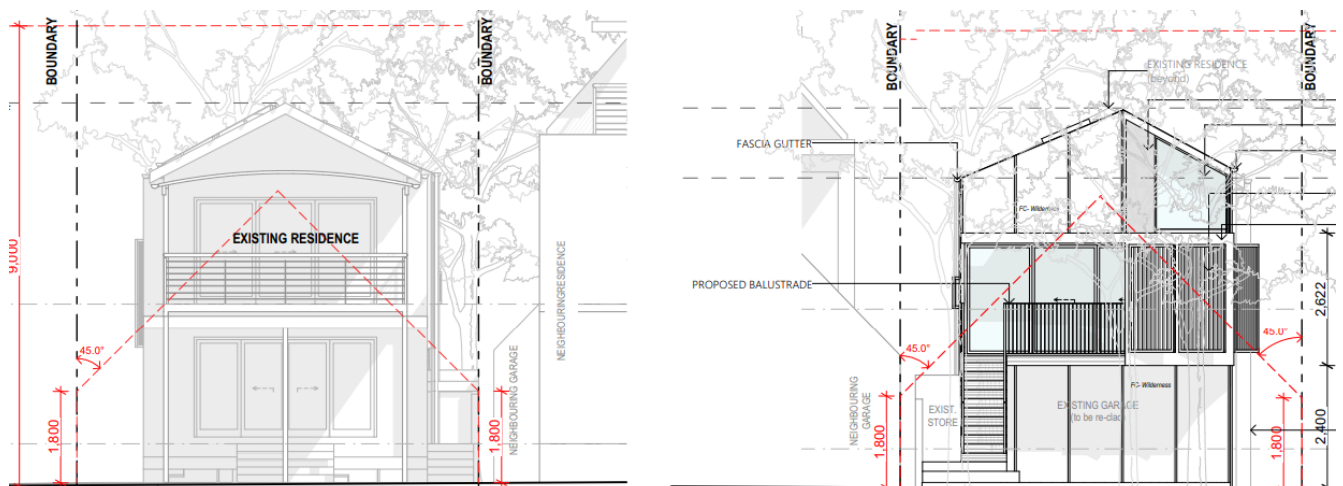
Building height plane encroachments of existing dwelling and proposed studio
